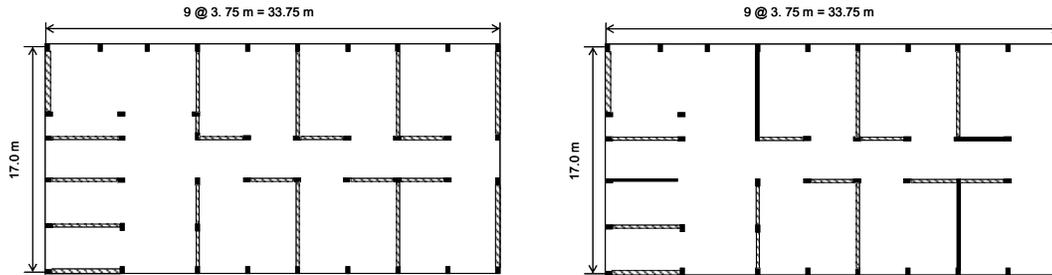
Floor plans for template RC moment-resisting frame (left) and dual system (shear wall and moment-resisting frame) (right) schools in Turkey. Solid small rectangles: columns; solid long rectangles: RC shear walls; hatched long rectangles: full-bay masonry infill walls; solid lines: perimeter masonry infill walls with openings.
